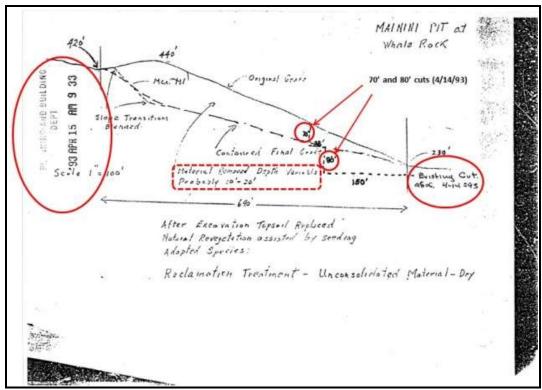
Cross Section with Inspection Notes. Source: Inspection File
